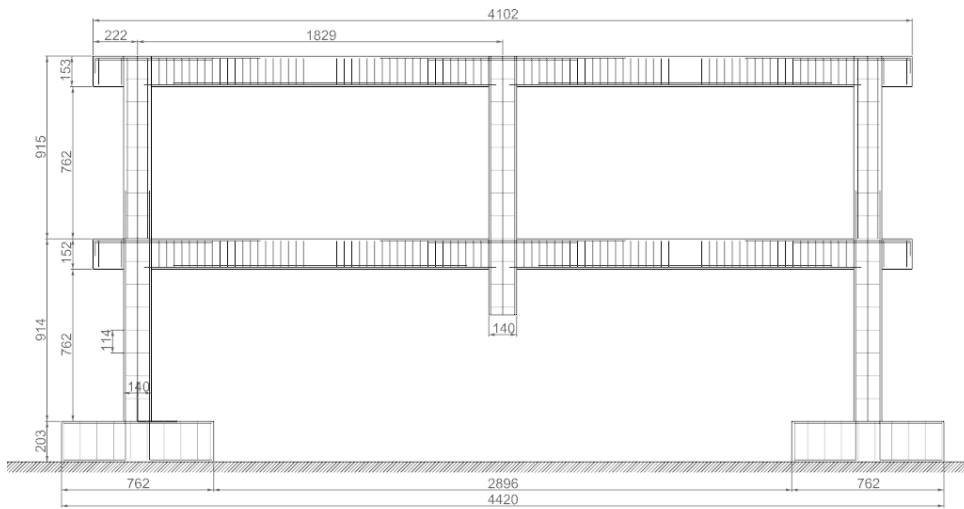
Two-storey RC frame specimen with beams with discontinuous longitudinal reinforcement
